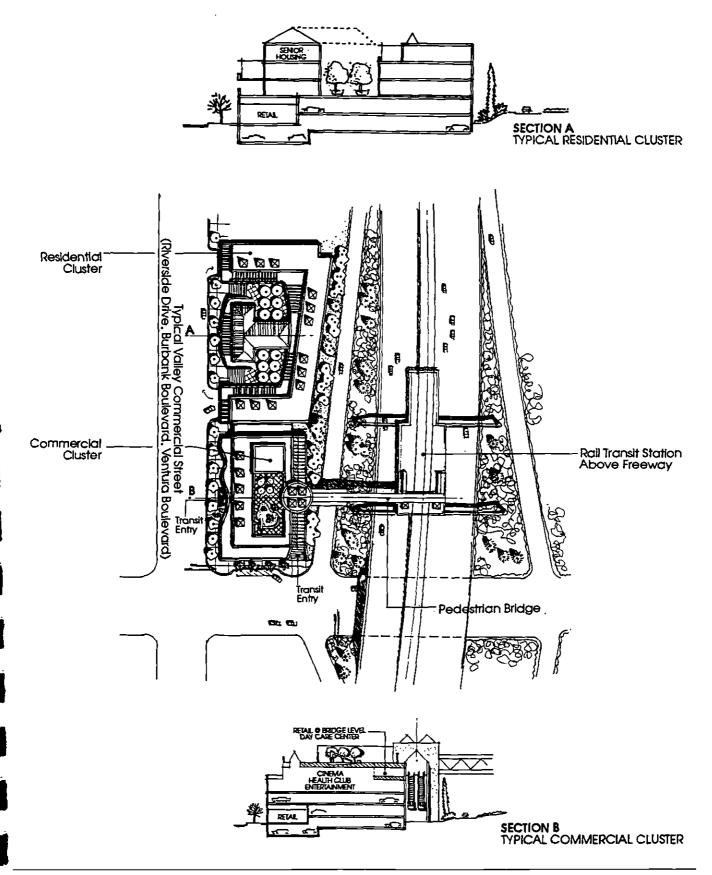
Typical Joint Development Adjacent to Freeway Aerial Transit Station
